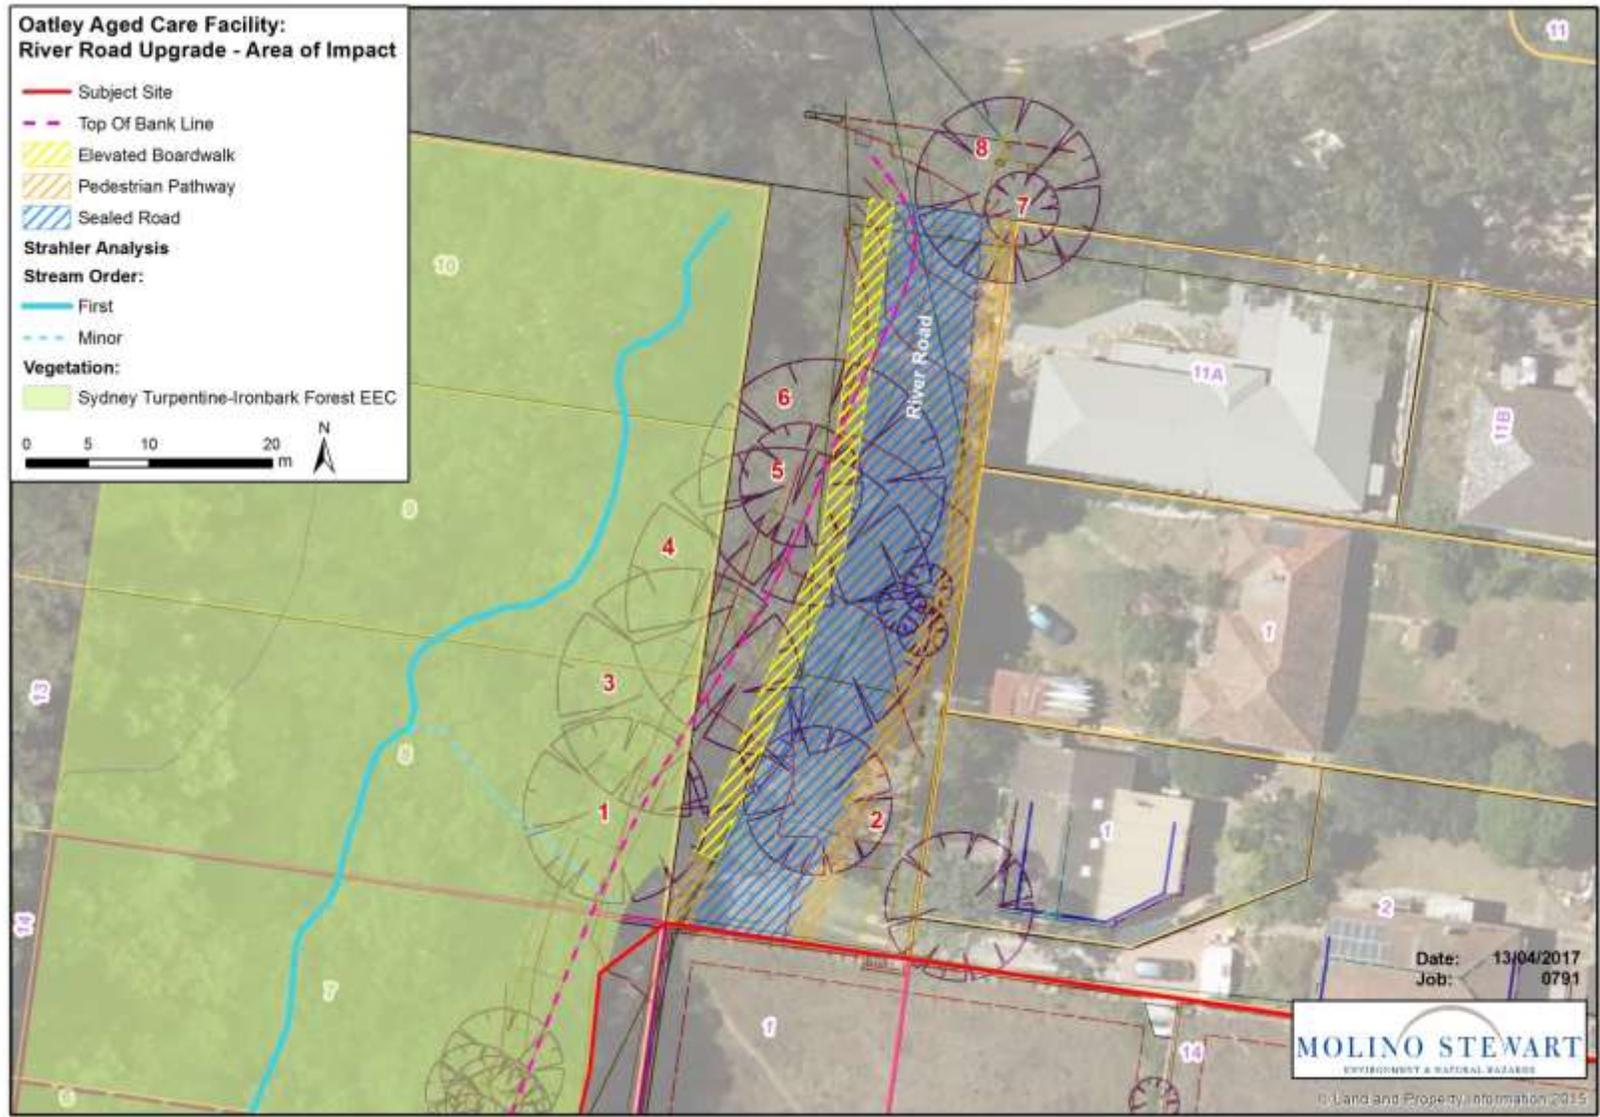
Conceptual plan for upgrade to River Road and potential loss of existing vegetation within road reserve
